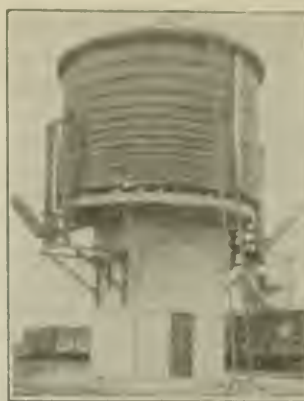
WATER STATION WITH CONCRETE TOWER, CHICAGO & NORTHWESTERN RAILWAY
